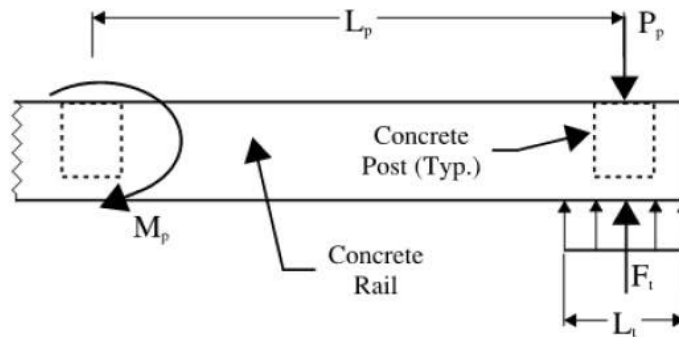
Single-Span Failure Mode for Post-and-Beam Railings at an End Section or Joint
